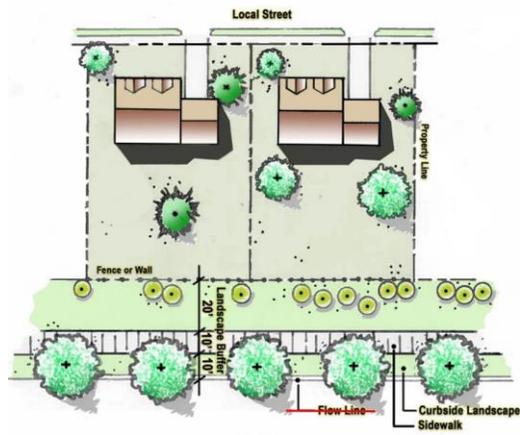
Arterial Street (Painted Median) Frontage Buffer Measurement Detached Straight Walk
